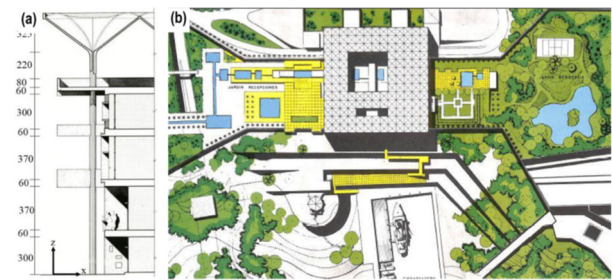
Façade elevation showing 8-sided umbrellas and (b) aerial view of the proposed Cuba Presidential Complex [5]
